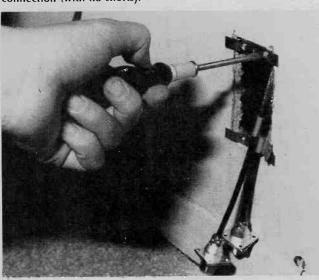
Install the quick-mount strips; the U-indent on the outside strip must face the interior of the wall.
